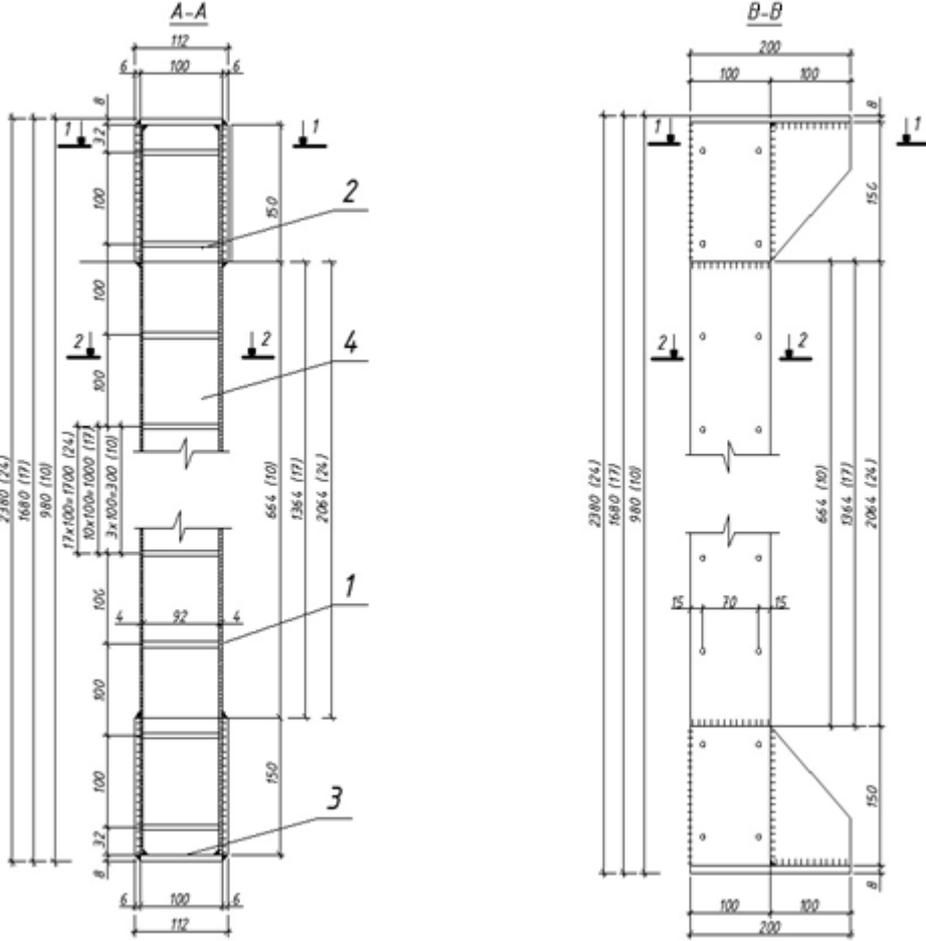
Constructions of experimental samples with reinforcing sheets in the plane of bending moment action:
